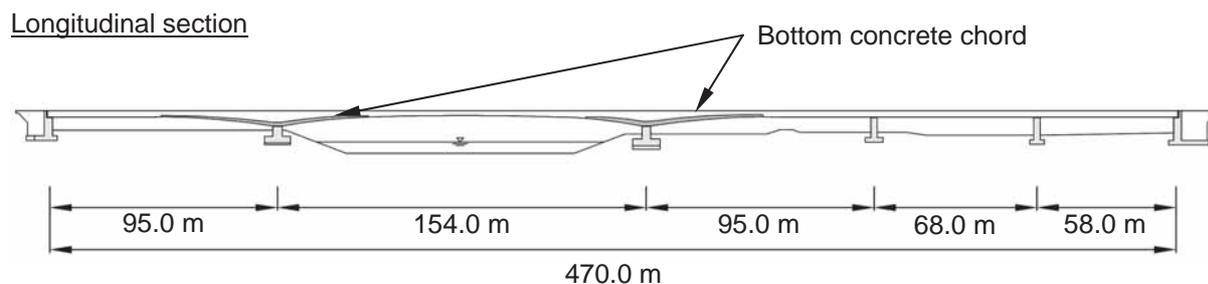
Longitudinal section of the Inn river bridge Neuötting, Germany, 2000.
